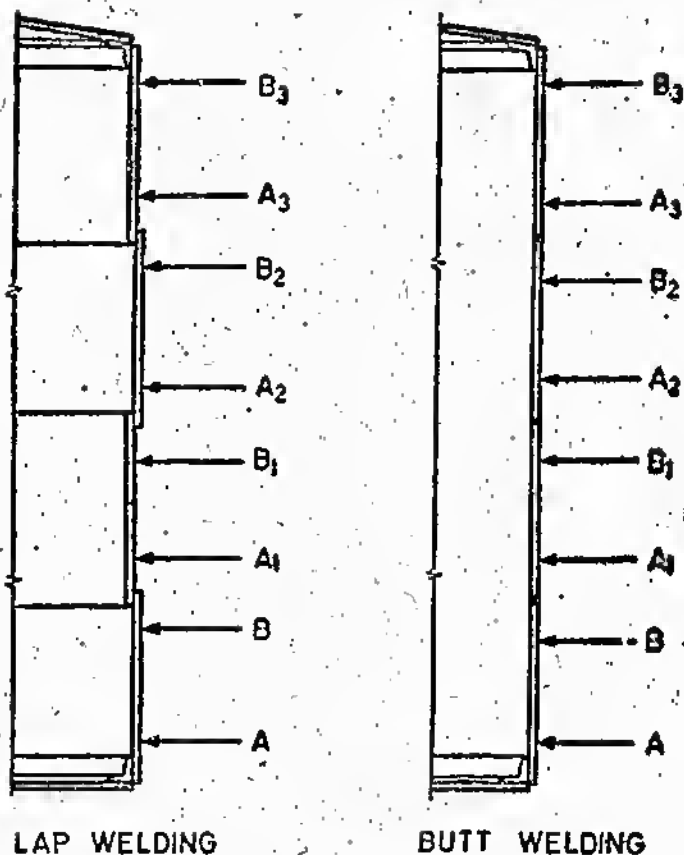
LOCATIONS OF MEASUREMENTS OF WELDED TANKS
